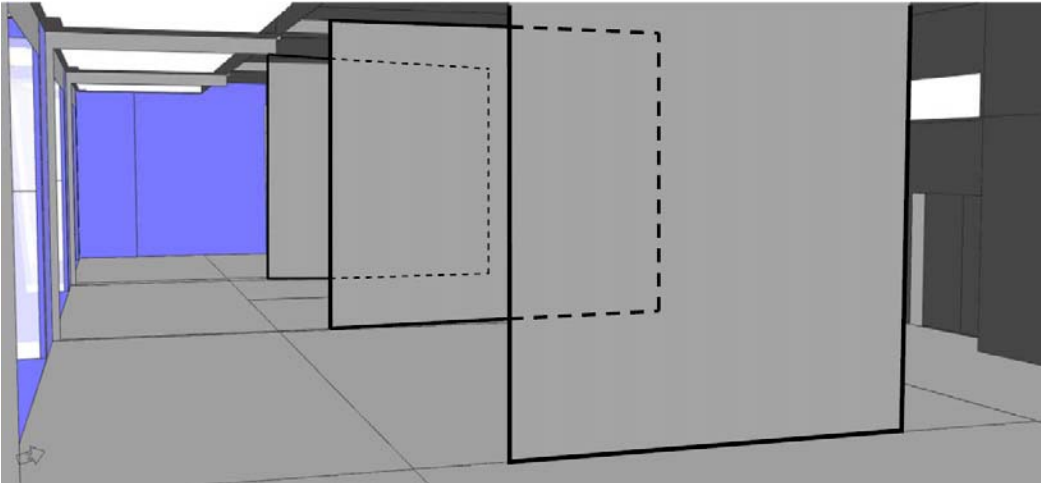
Second level Studio, view of the three massive stands alone walls – view from the south wall.
